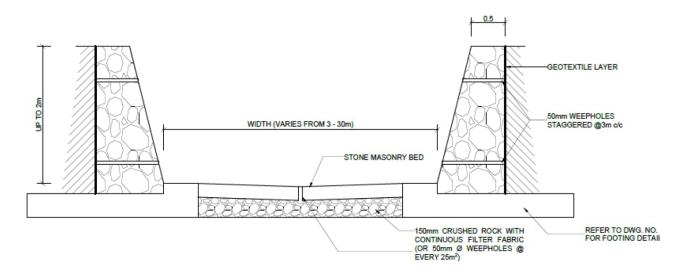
Trapezoidal Channel SectionSource:Kampala Drainage Masterplan 2016
